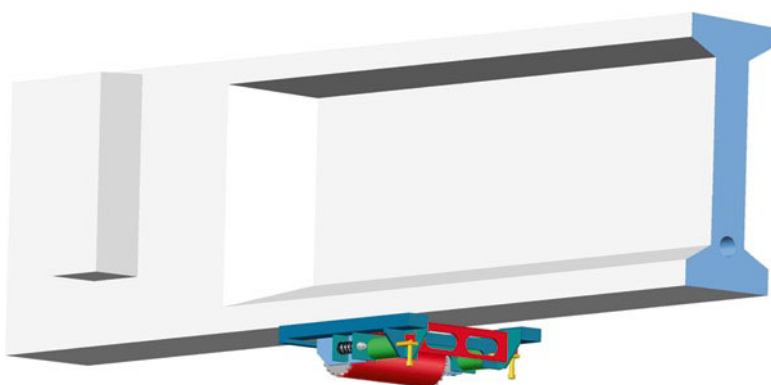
Sketch of the FRP prestressing machine applied under a bridge beam
